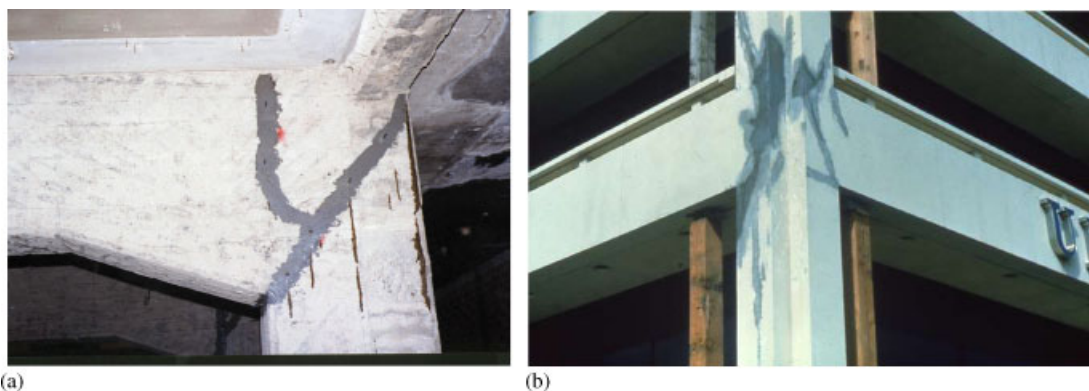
Application of the: (a) epoxy resin; (b) cement grout injection in beam–column joints
